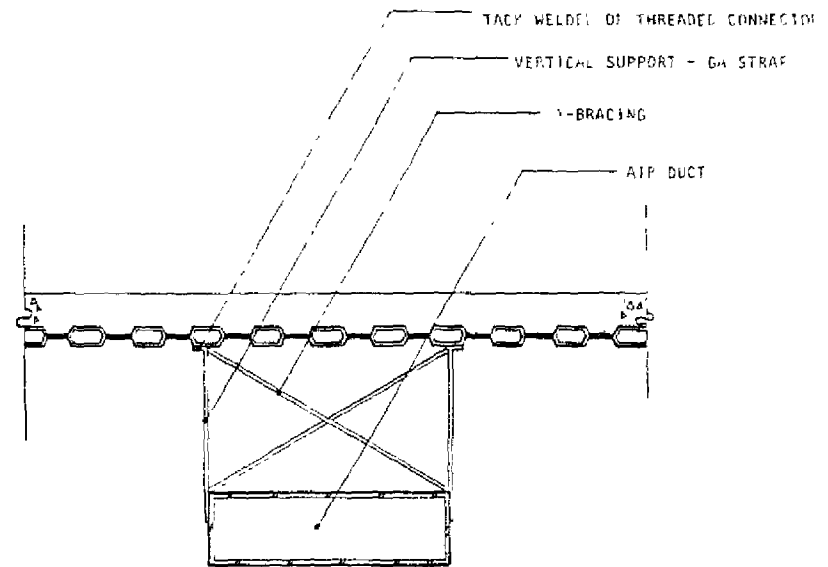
Air handling systems. Air duct suspension and lateral bracing.
